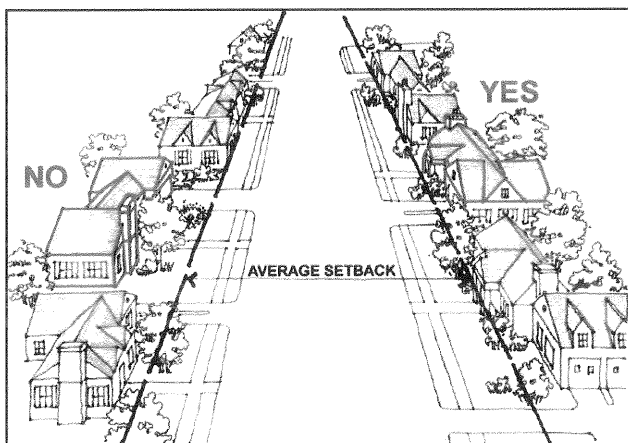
The new construction (outlined in red) on the right demonstrates appropriate average setbacks. The dwelling outlined in red on the left has a front setback that is too deep.
